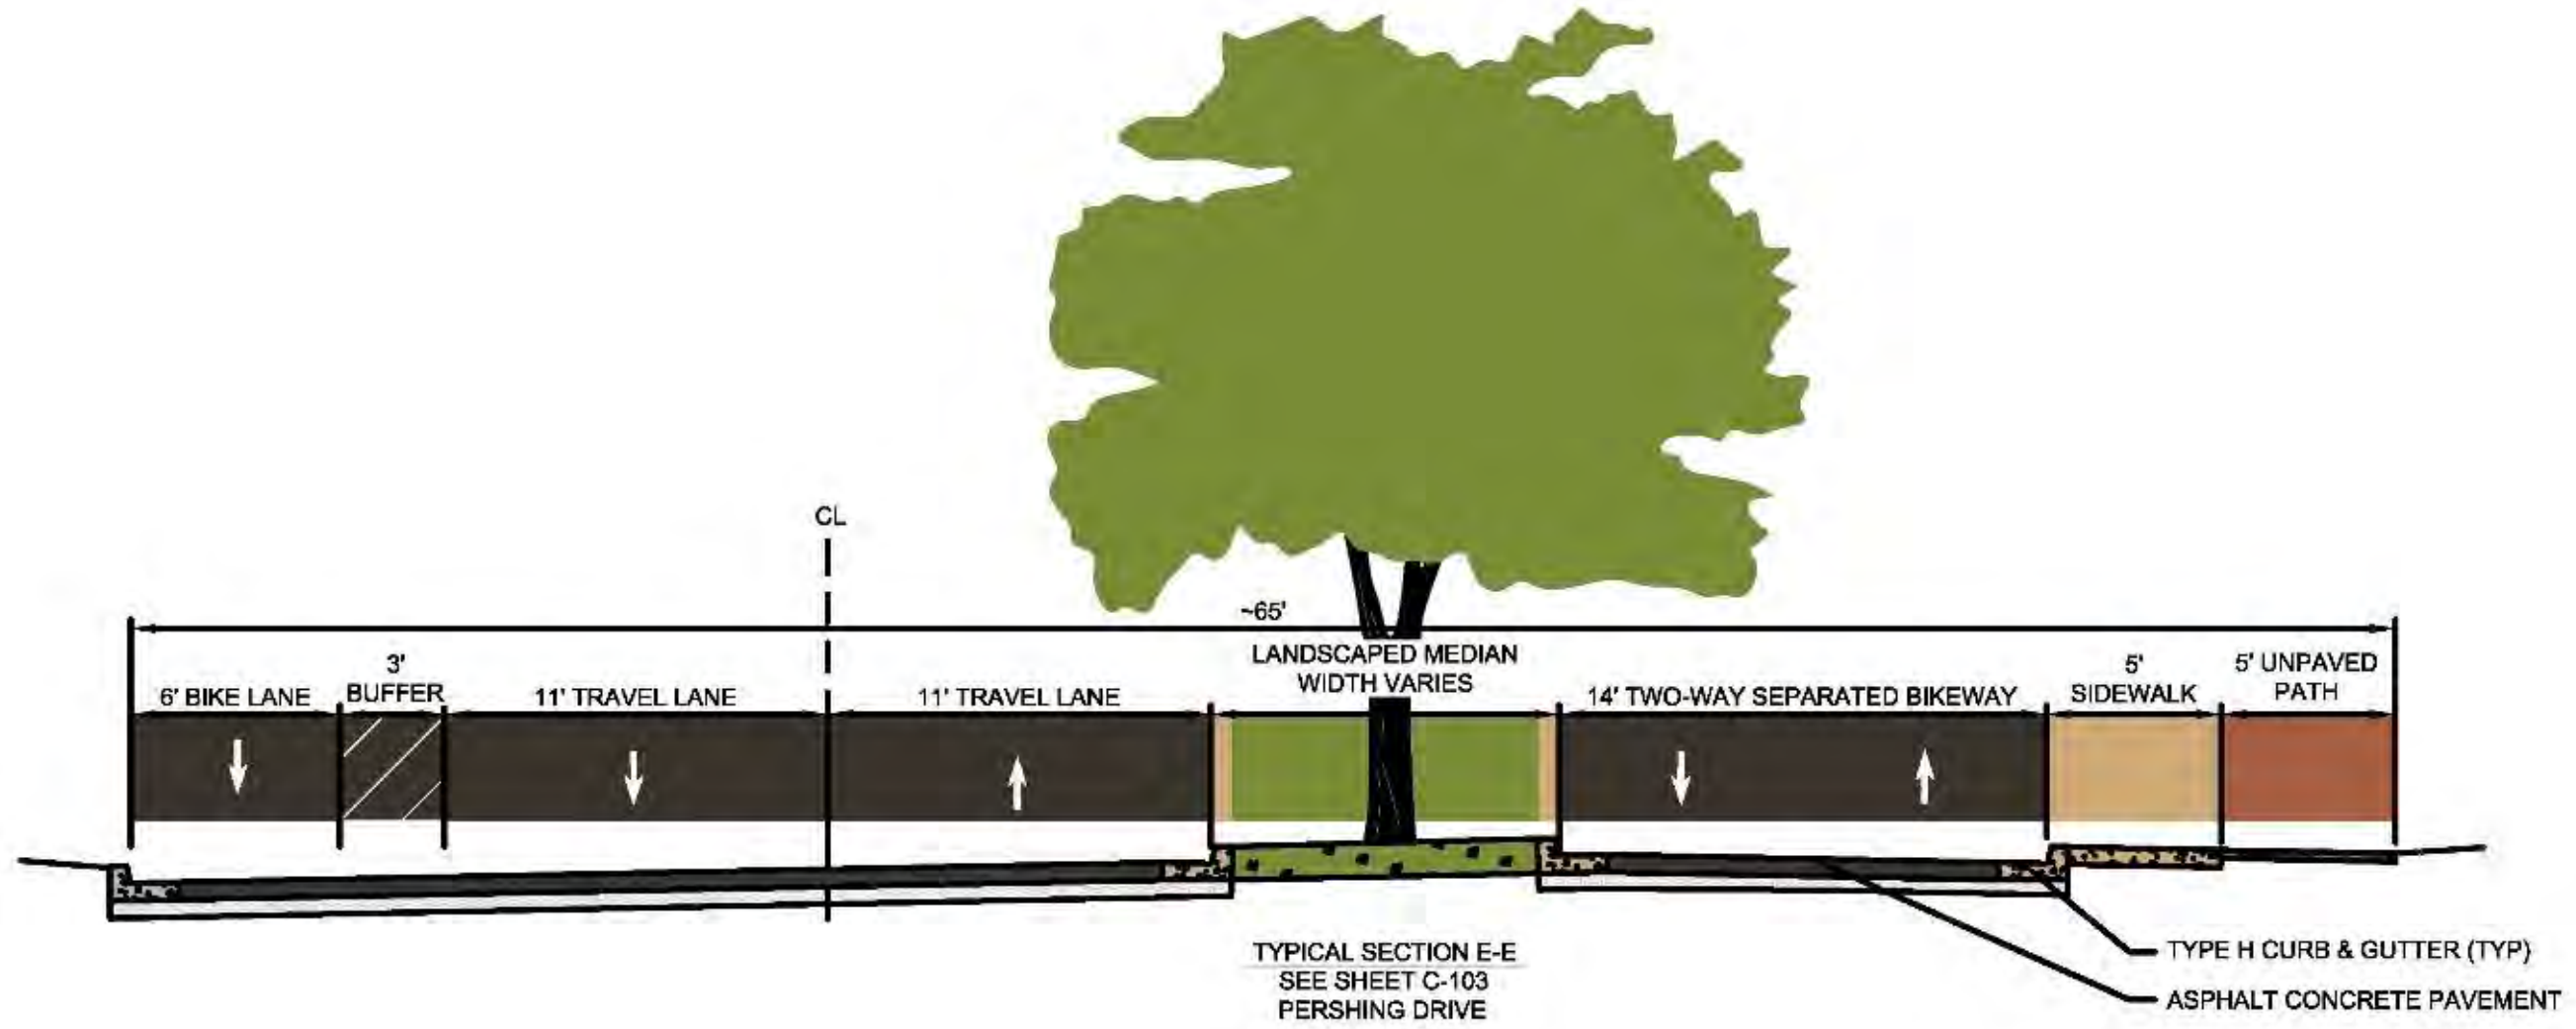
Typical Cross Section on Pershing Drive between Florida Drive/26<sup>th</sup> Street and Redwood Street (NB)
